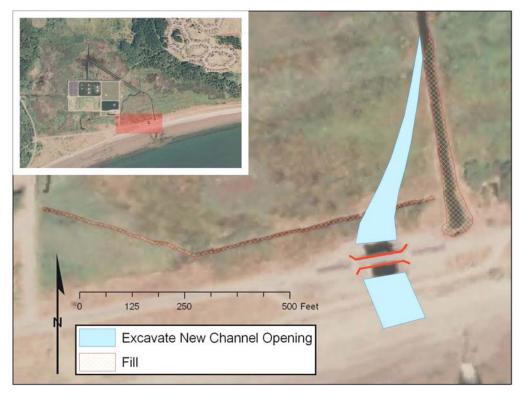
A new channel through the beach berm will be excavated beneath a bridge installed by NASWI SeaBees in 2006, and current channels and ditches will be filled.
